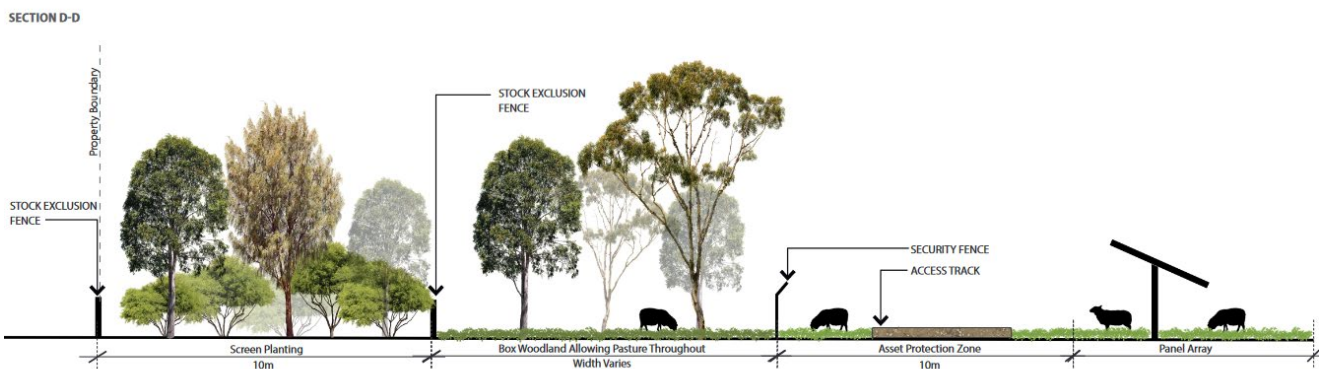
Proposed structure of planting at the southern site boundary (Section DD of the Landscape Concept Plan)
